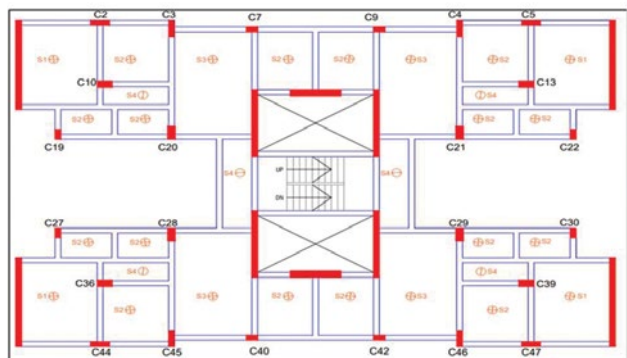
Building floor plan showing column and foundation layout for Alternative 2 (drawing not to scale)
